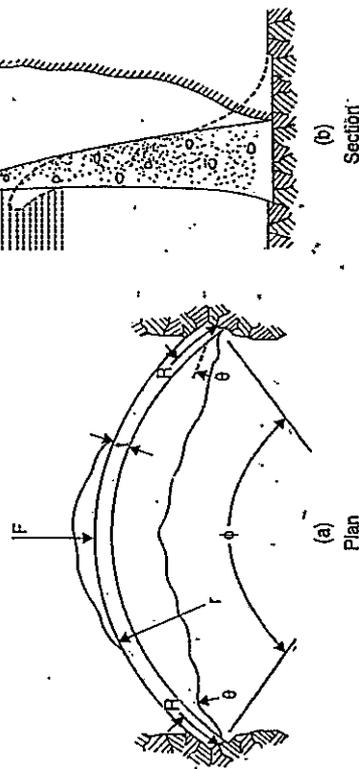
Typical arch dam : (a) Plan (b) Section.
